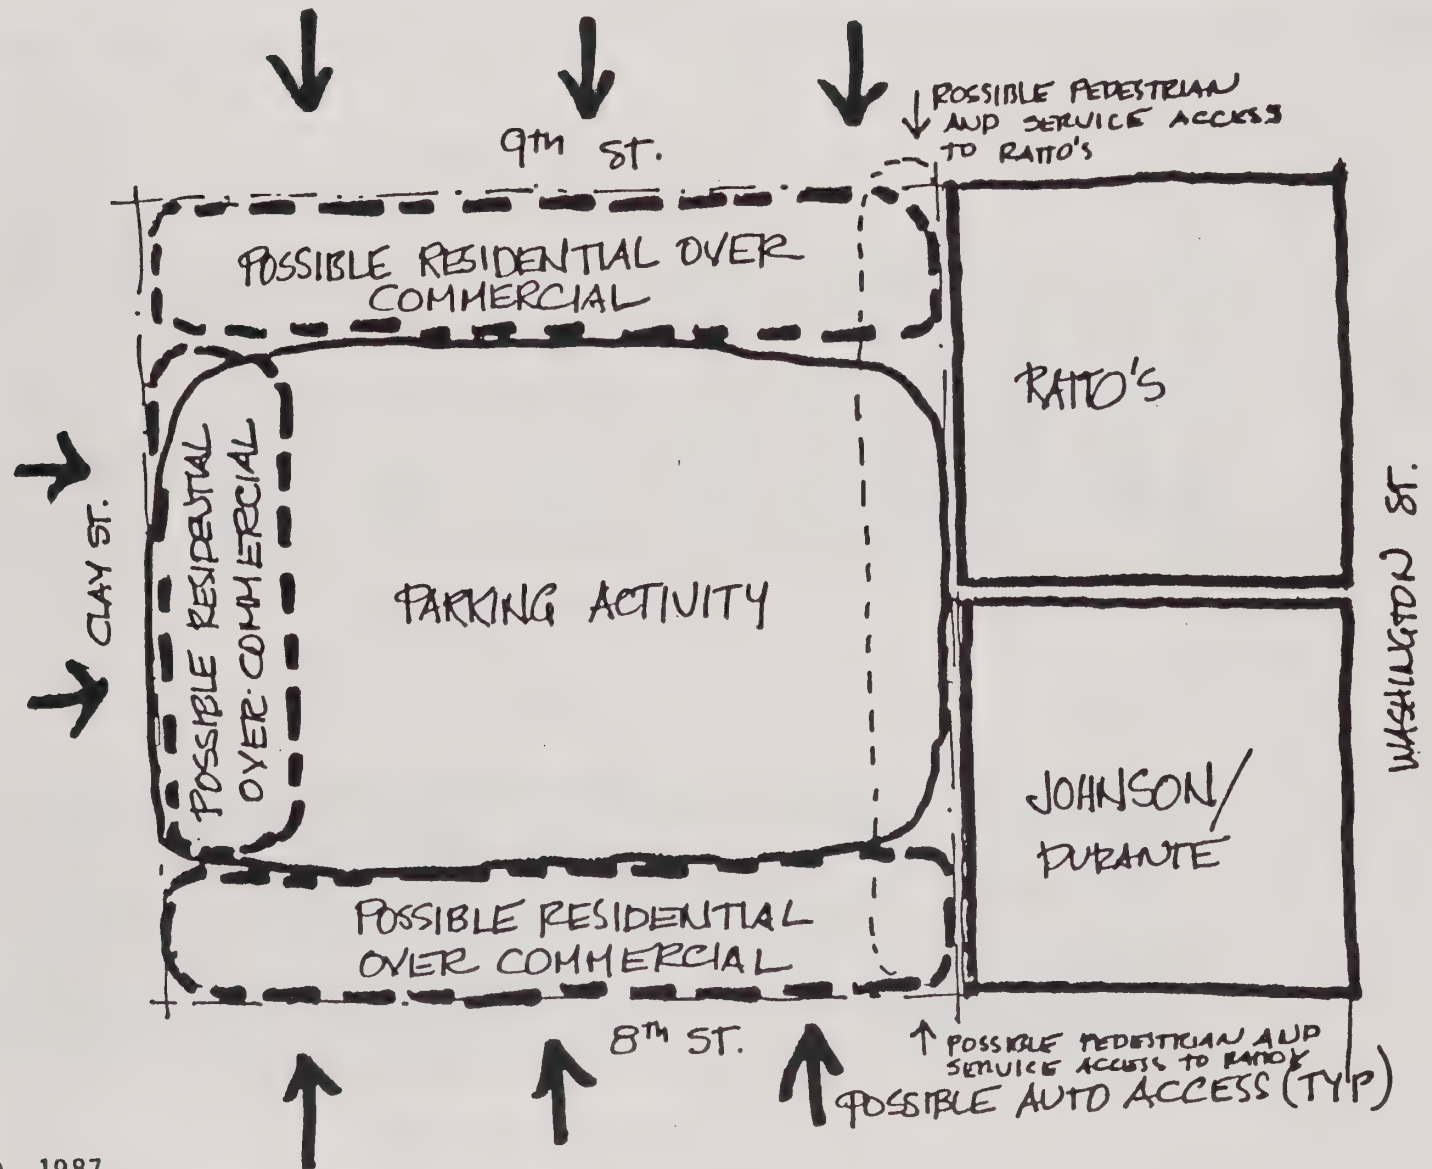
PROPOSED PROJECT PLOT PLAN
